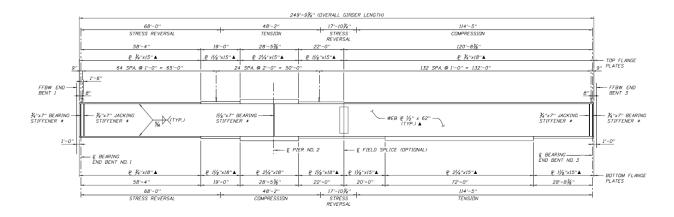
Girder elevation for the SR-589 Bridge over Hillsborough Avenue
